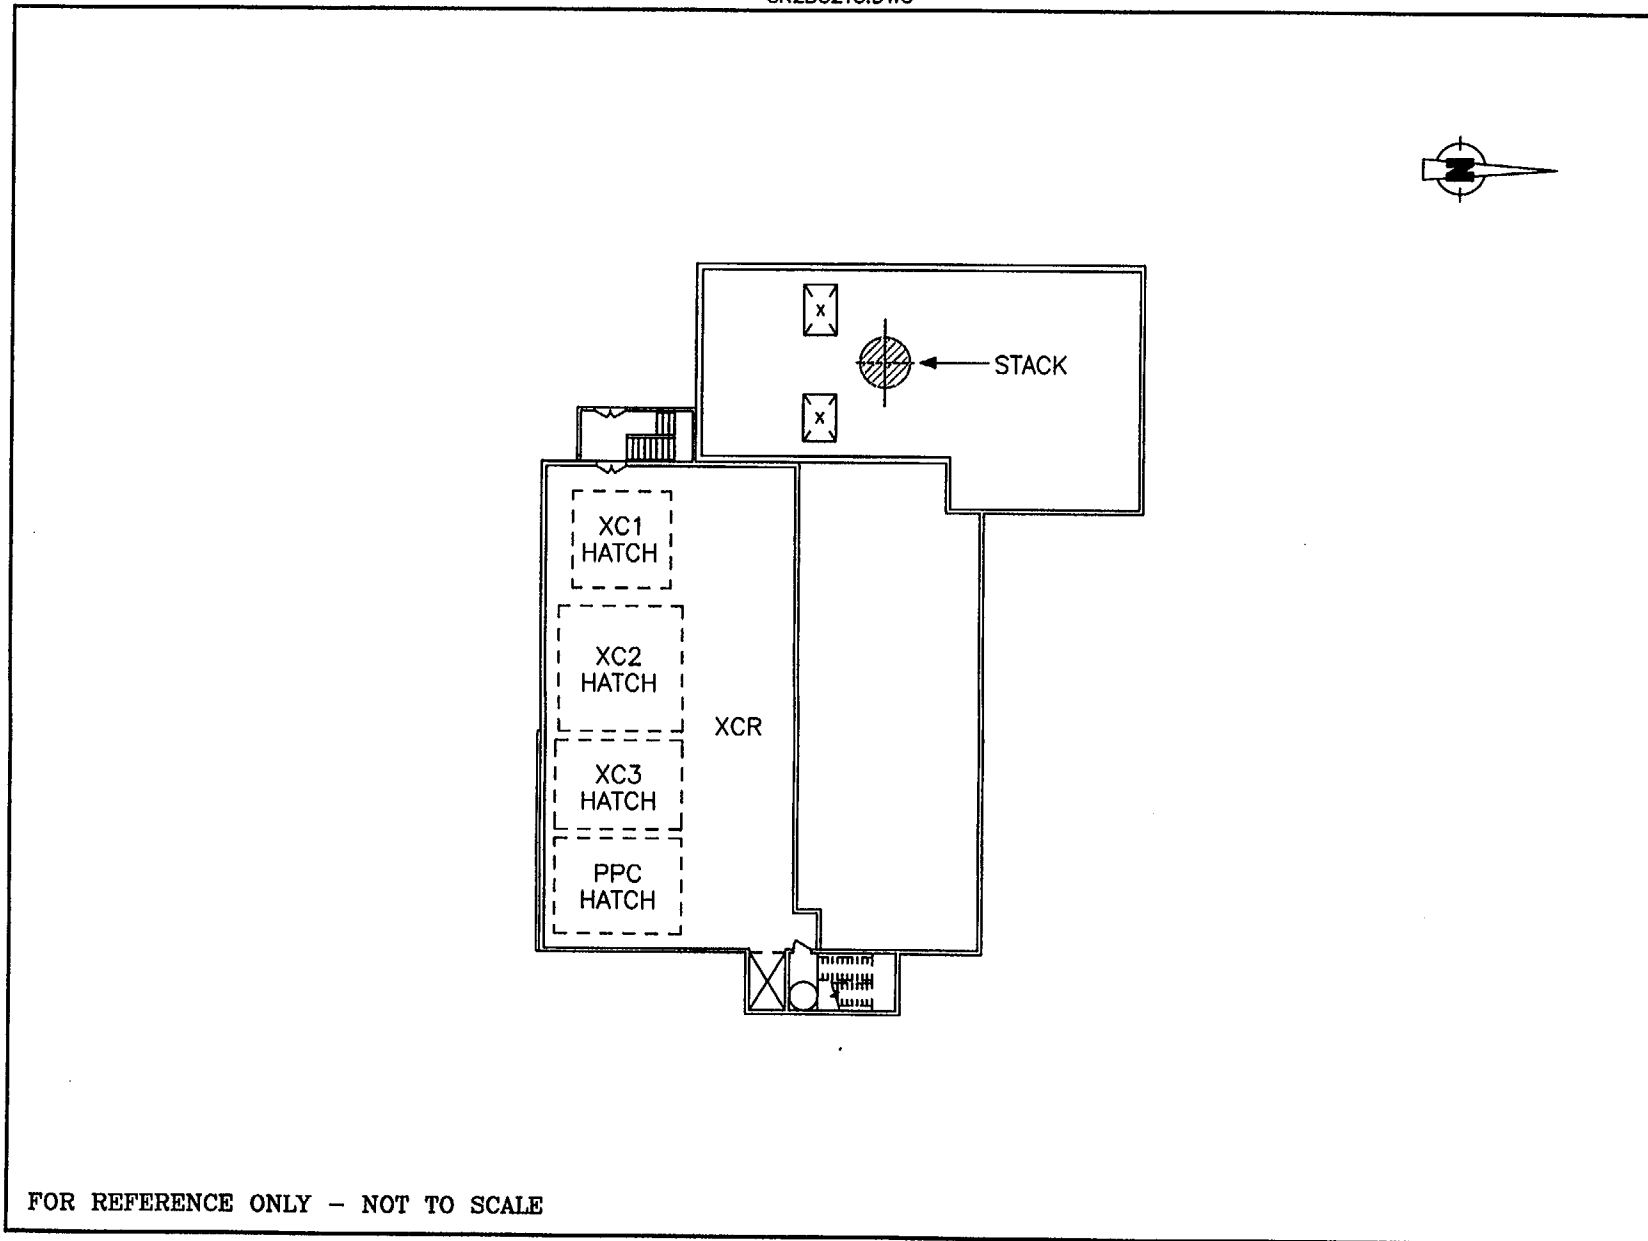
Main Plant Plan at Elevation 144.0'
